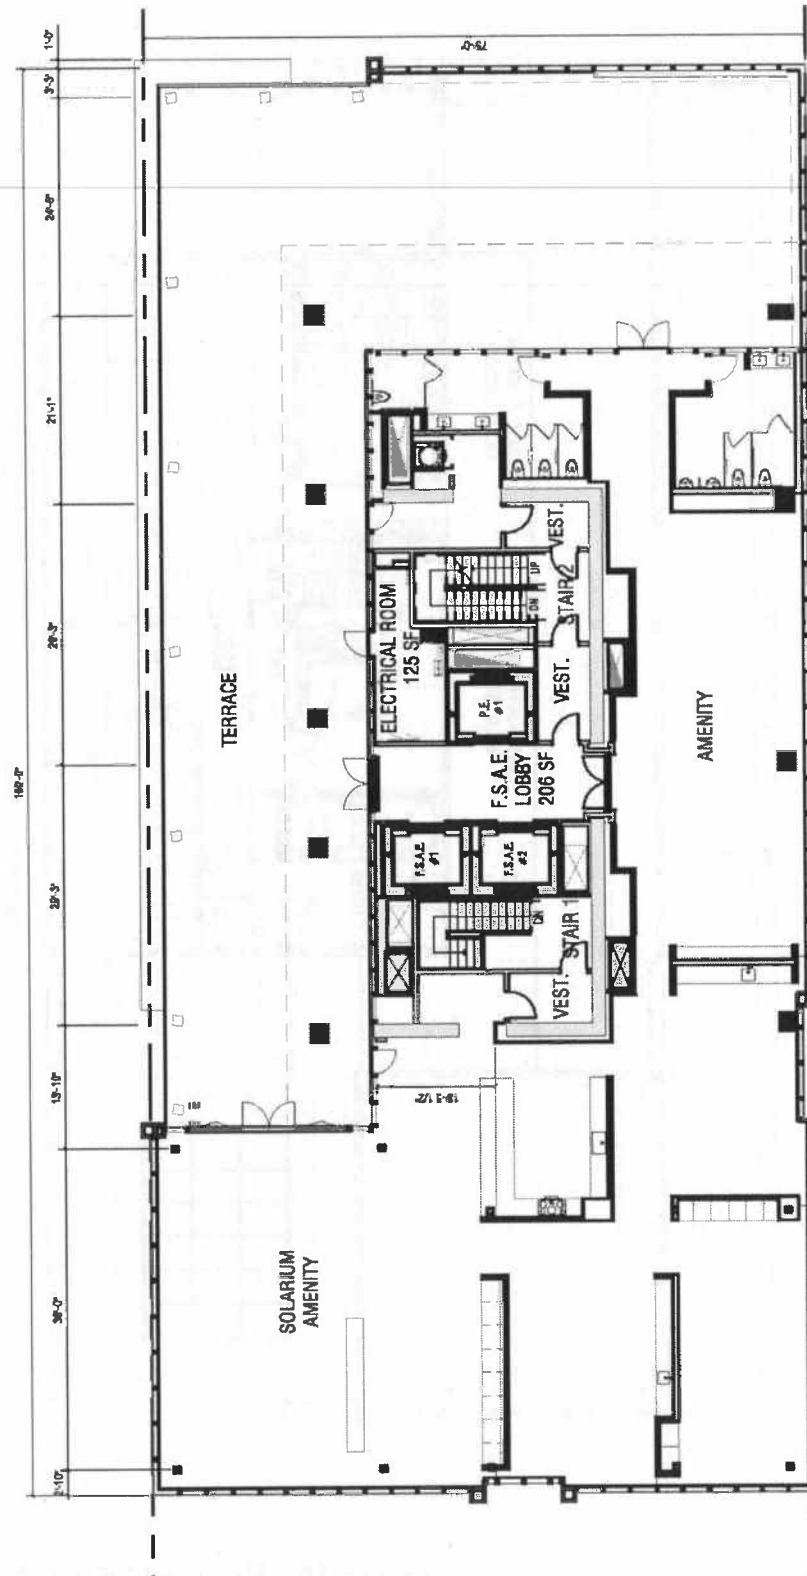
Proposed Level 35 Floor Plan (Roof Terrace Level)
